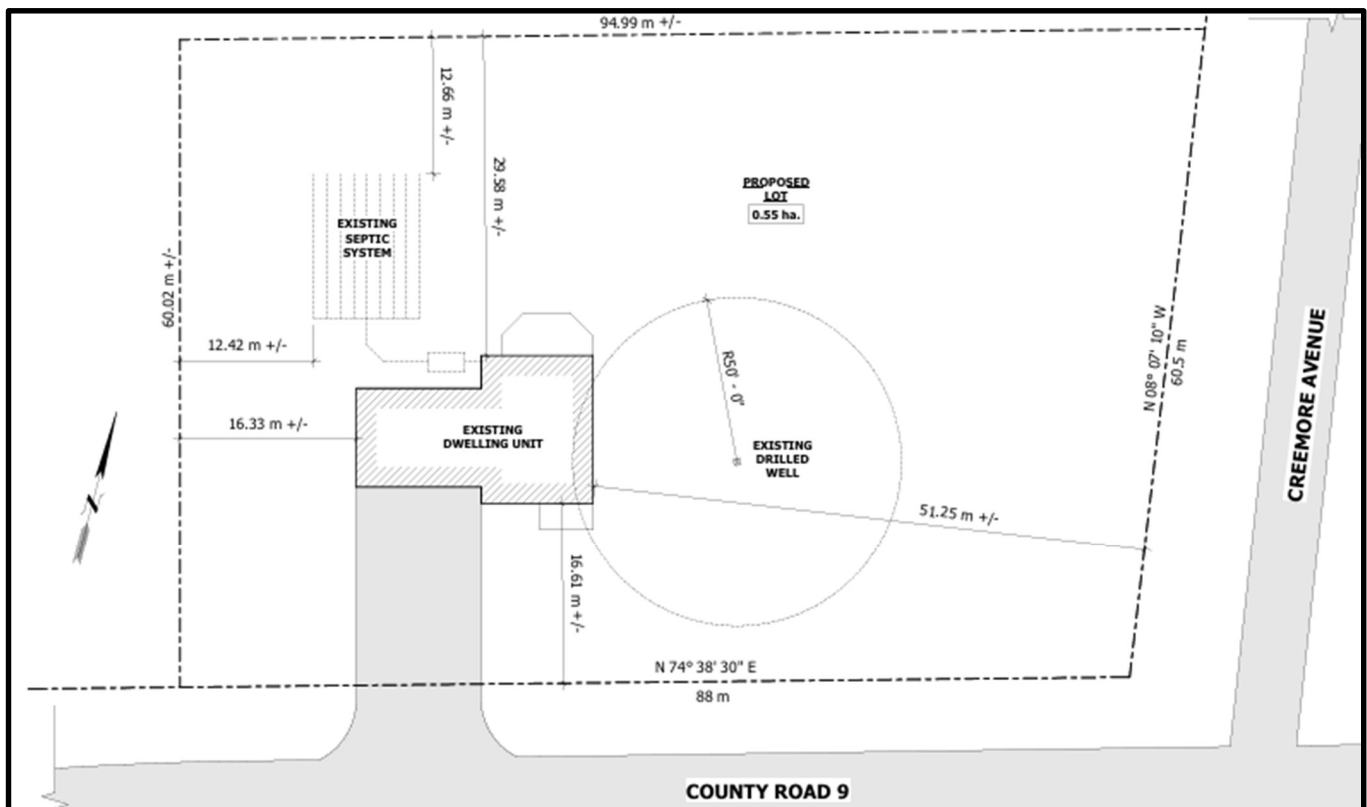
Proposed Farm Surplus Dwelling Lot and Retained Farmland Lot
